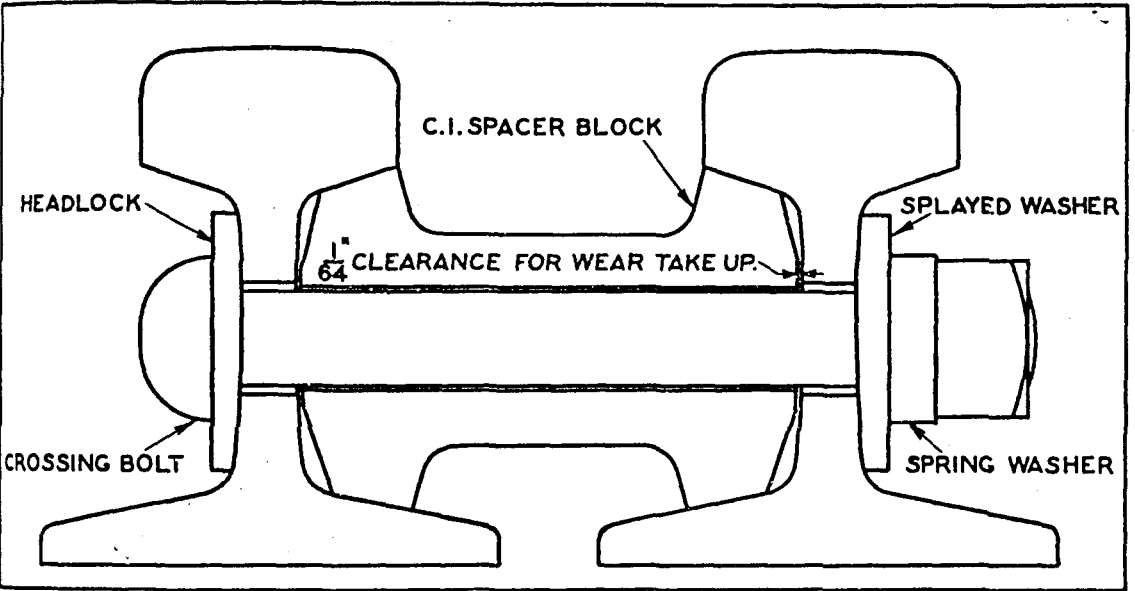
TYPICAL CAST IRON SPACER BLOCK FITTING.
